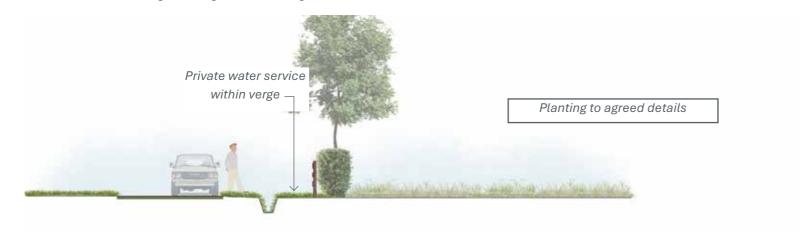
B: Section through Ardleigh Road, facing west, close to the attenuation ponds.
